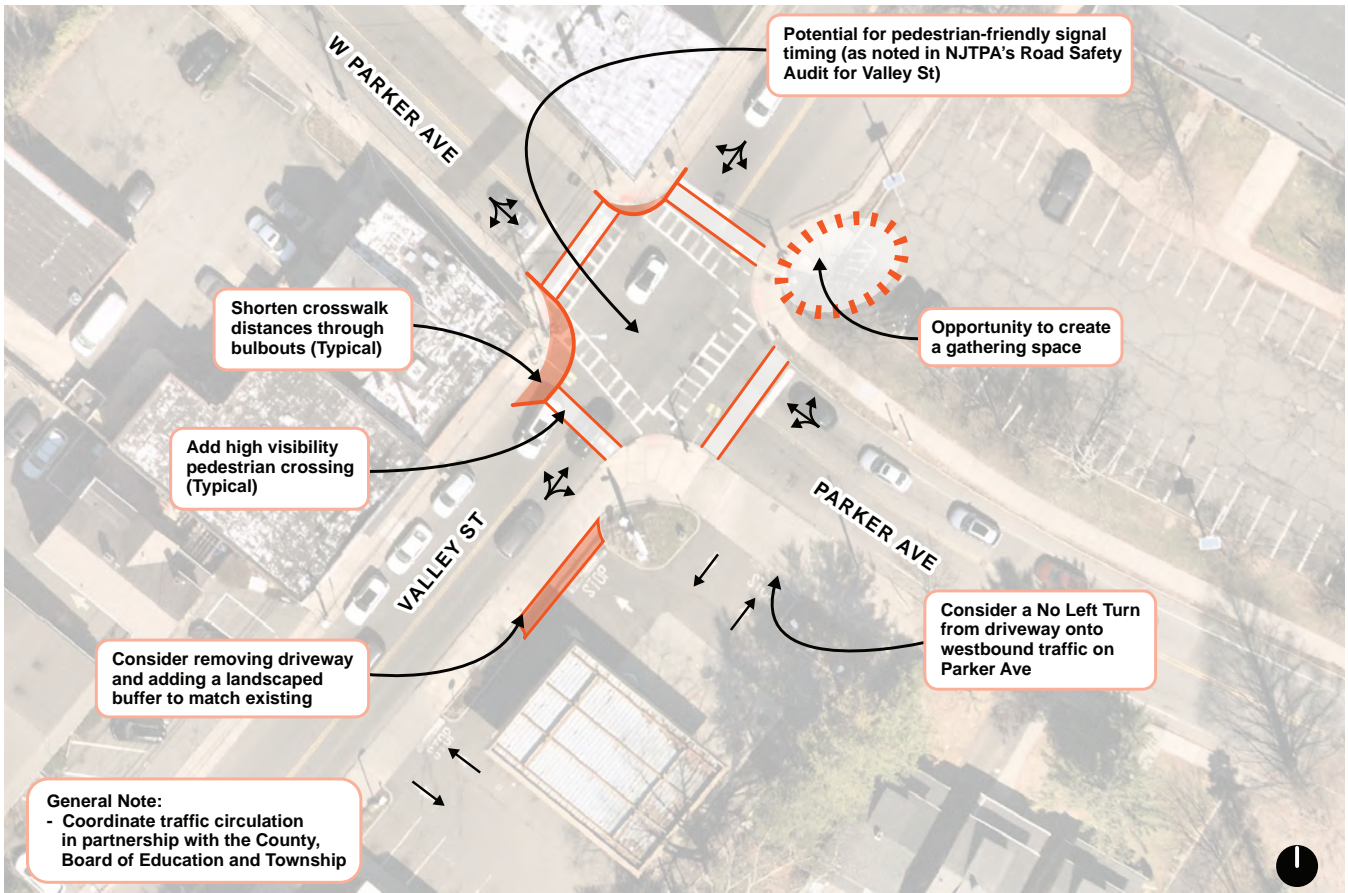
Conceptual Plan for the Intersection at Parker Avenue and Valley Street
